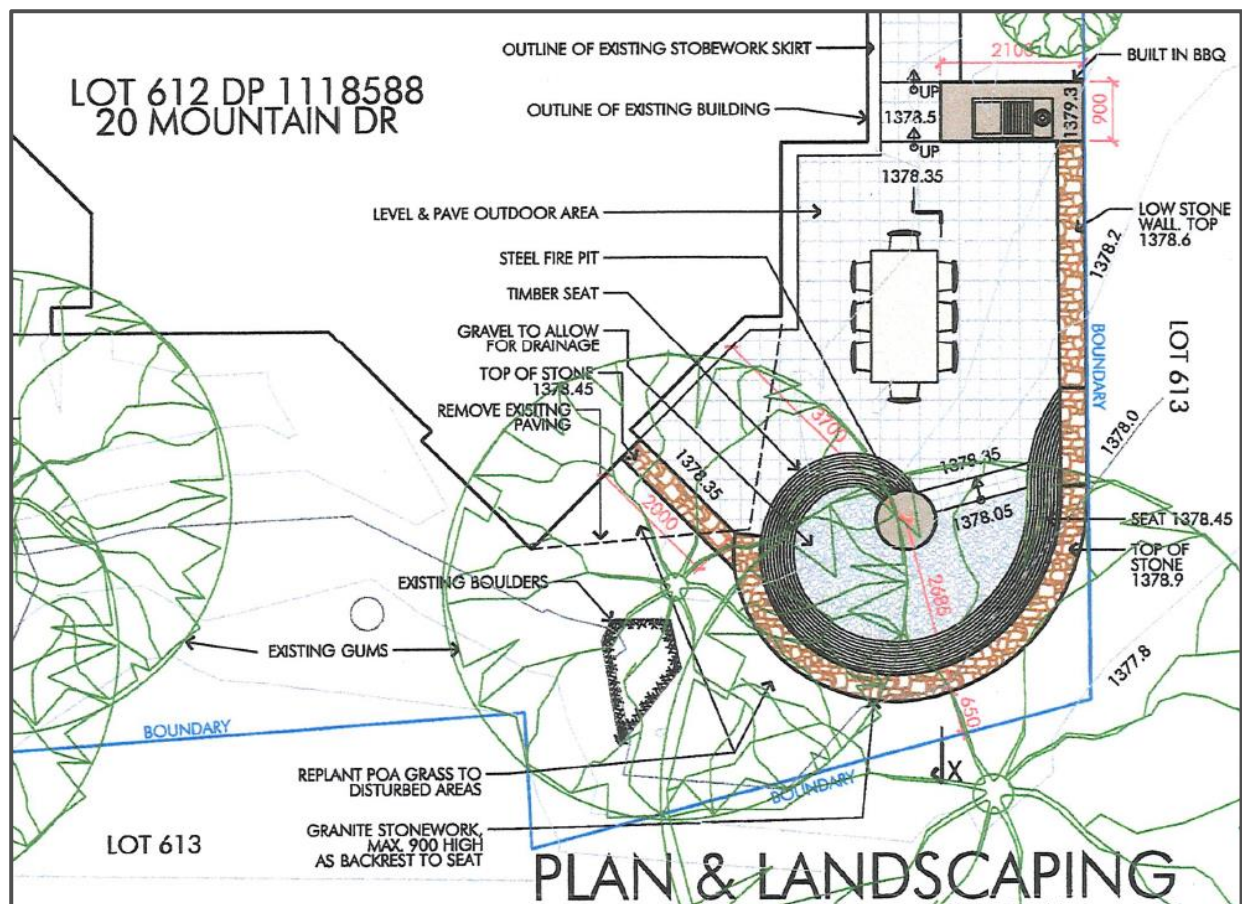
| Approved landscape plan (Source: DA 10247 approved documentation)
